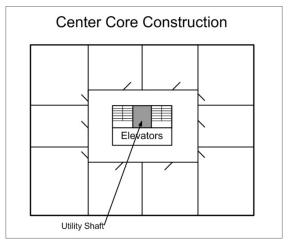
Center Core Construction Occupies the Outer Perimeter of the Structure and Houses the Stairs and Elevators in the Center
